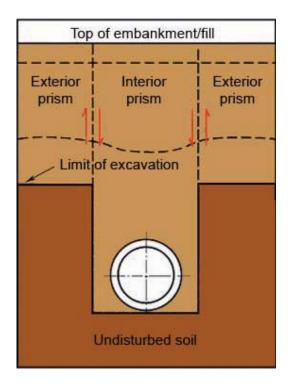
Negative projecting conduit. The pipe is installed in a shallow trench such that the top of the pipe is below natural ground or compacted fill, and then covered with fill material. Negative projecting conduits should not be used for embankment conduits or drainpipes (Note: This figure is not intended to show all the design details required.)
